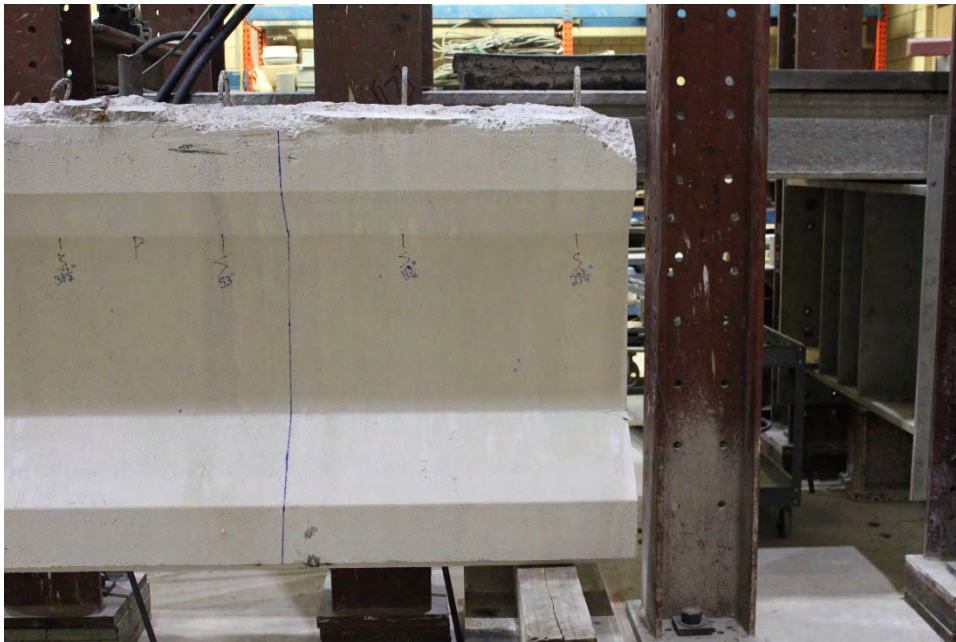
Girder P26 Prior to Casting – Section 8 (Cut-End)
